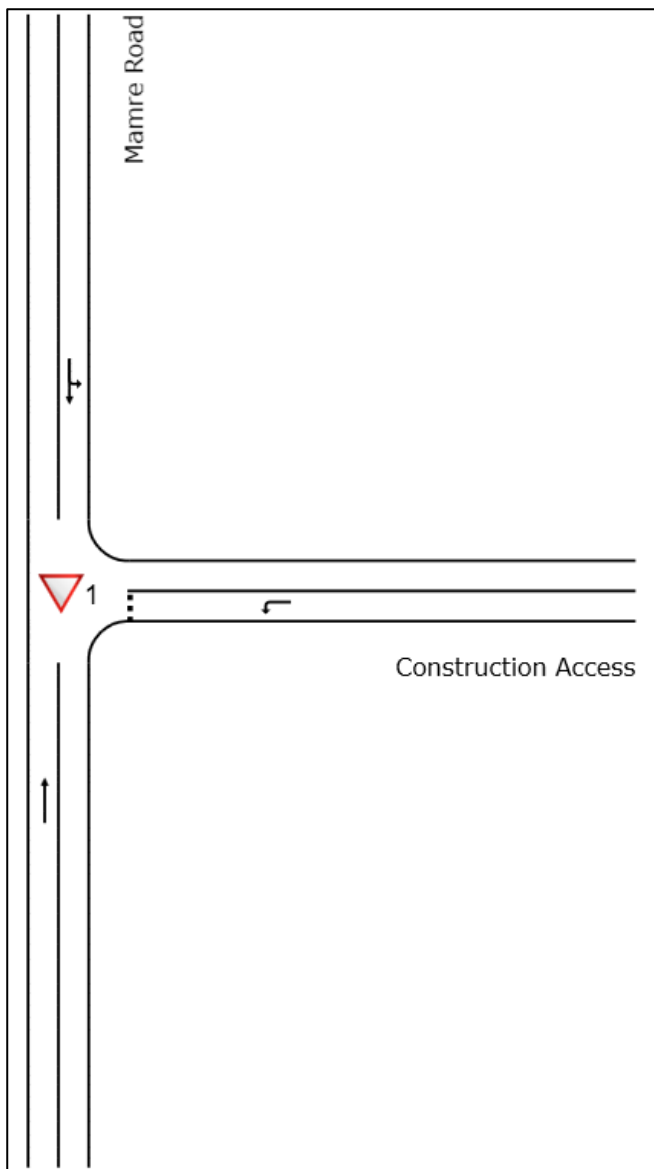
Interim Construction Access Layout Via Mamre Road / LILO
